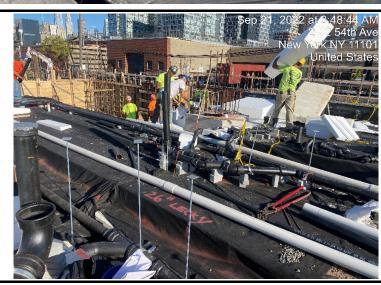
Concrete pour of foundation element, view facing northwest.
